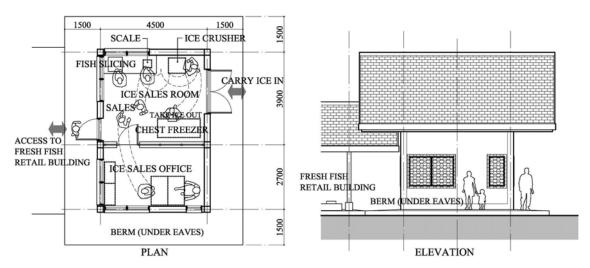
Floor Plans for Ice Storage/Sales Facilities
